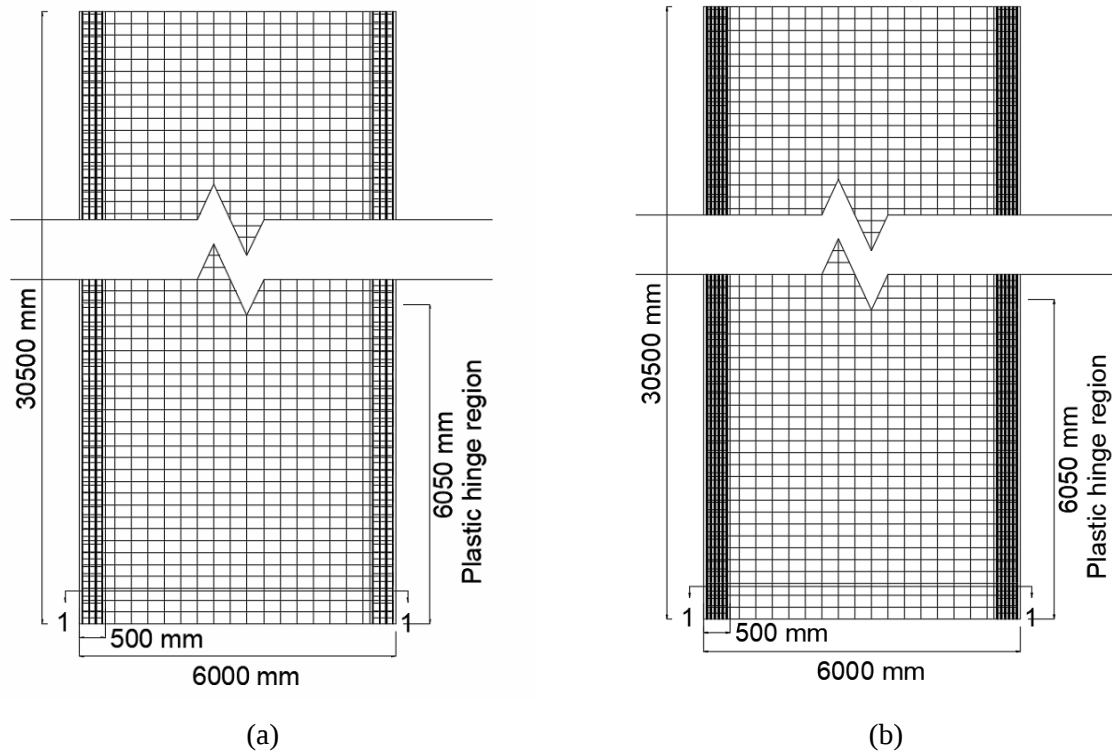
Elevation of steel-reinforced concrete shear walls: (a) Wall MDSRW and (b) Wall DSRW
